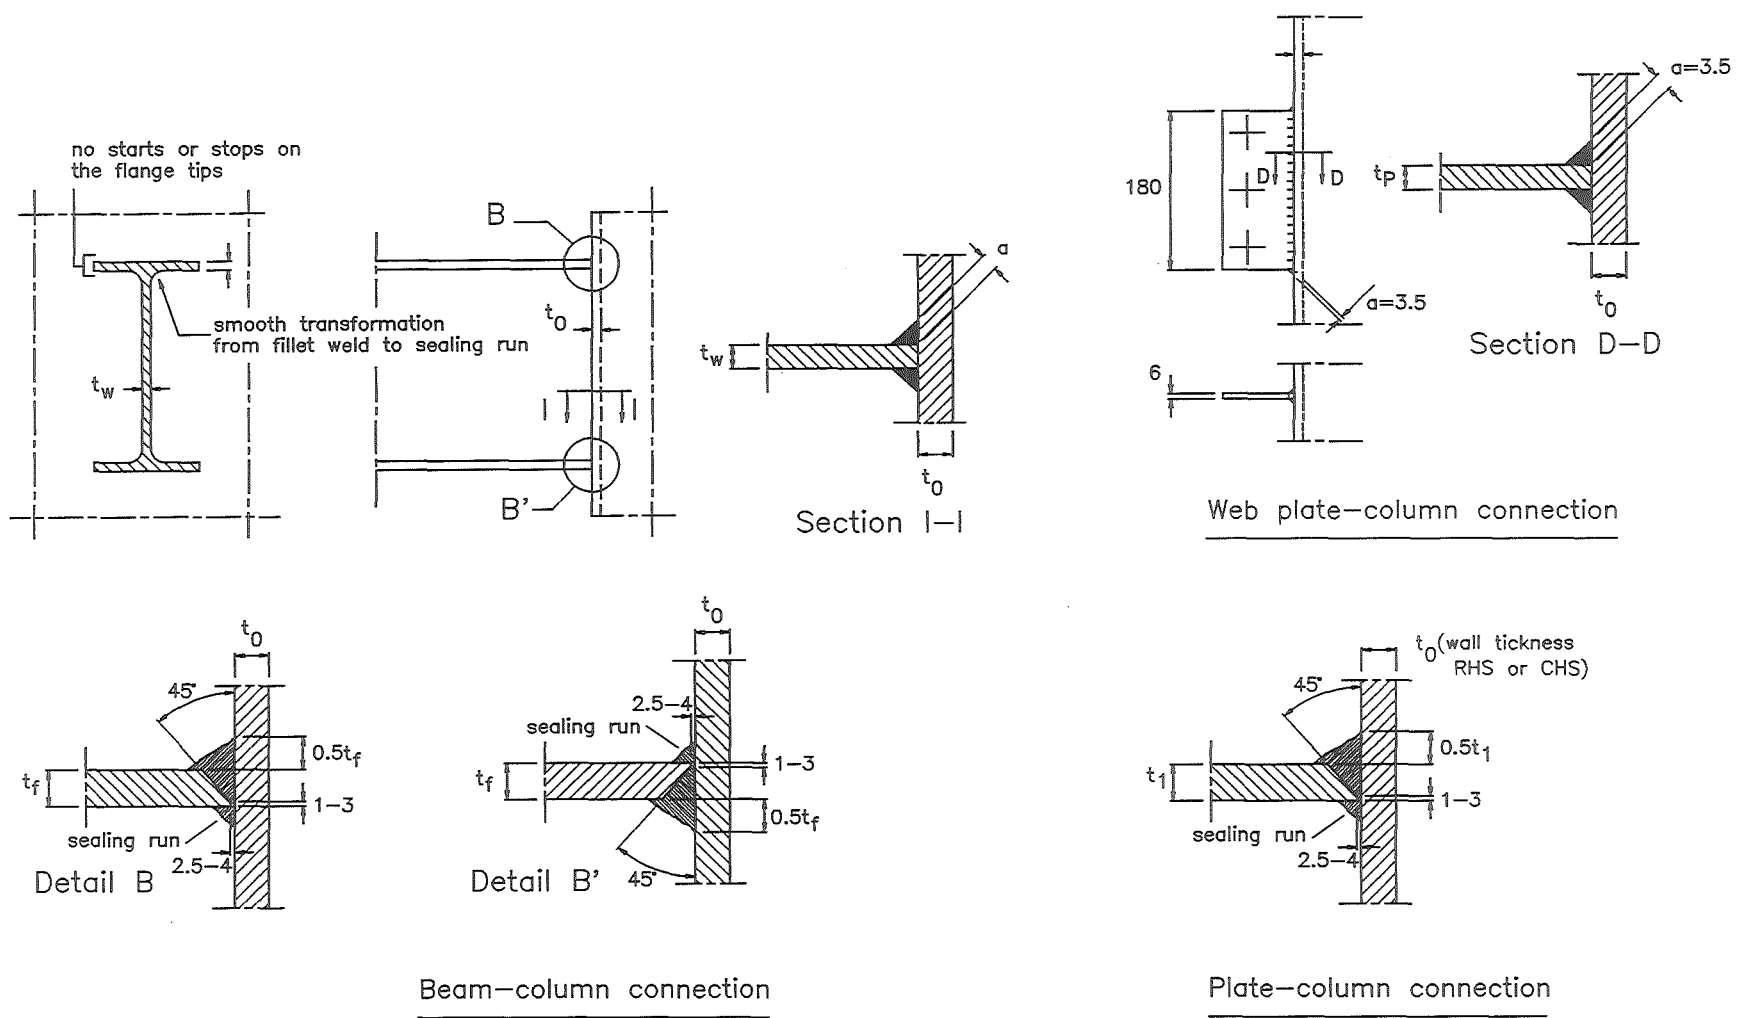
Welding details (welding process for all the welds : SMAW)
